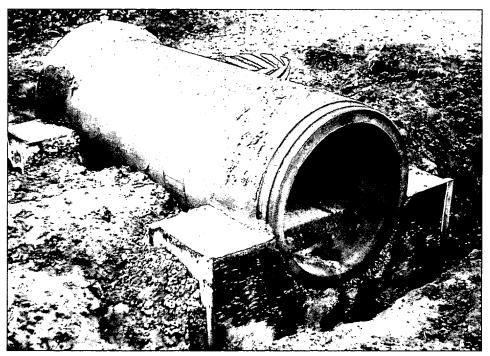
The pipe section is set into place while the concrete for the cutoff walls is still wet.
